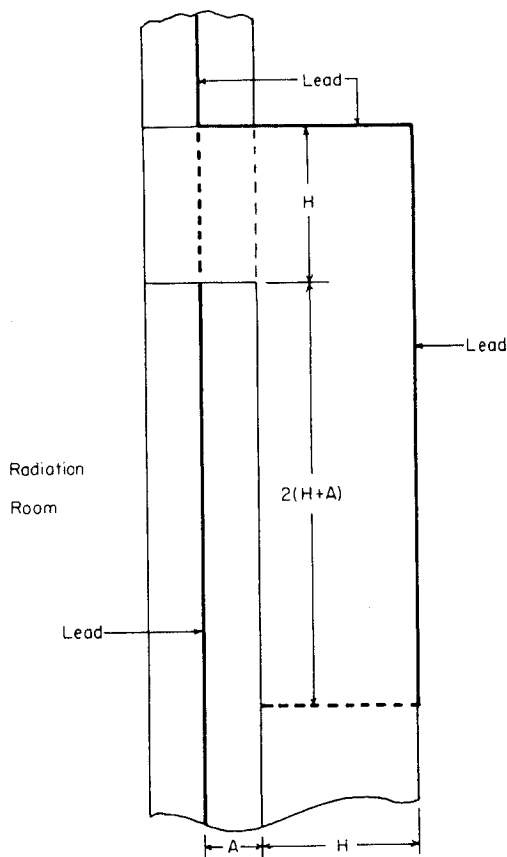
Typical baffle design for openings in secondary protective barrier.
